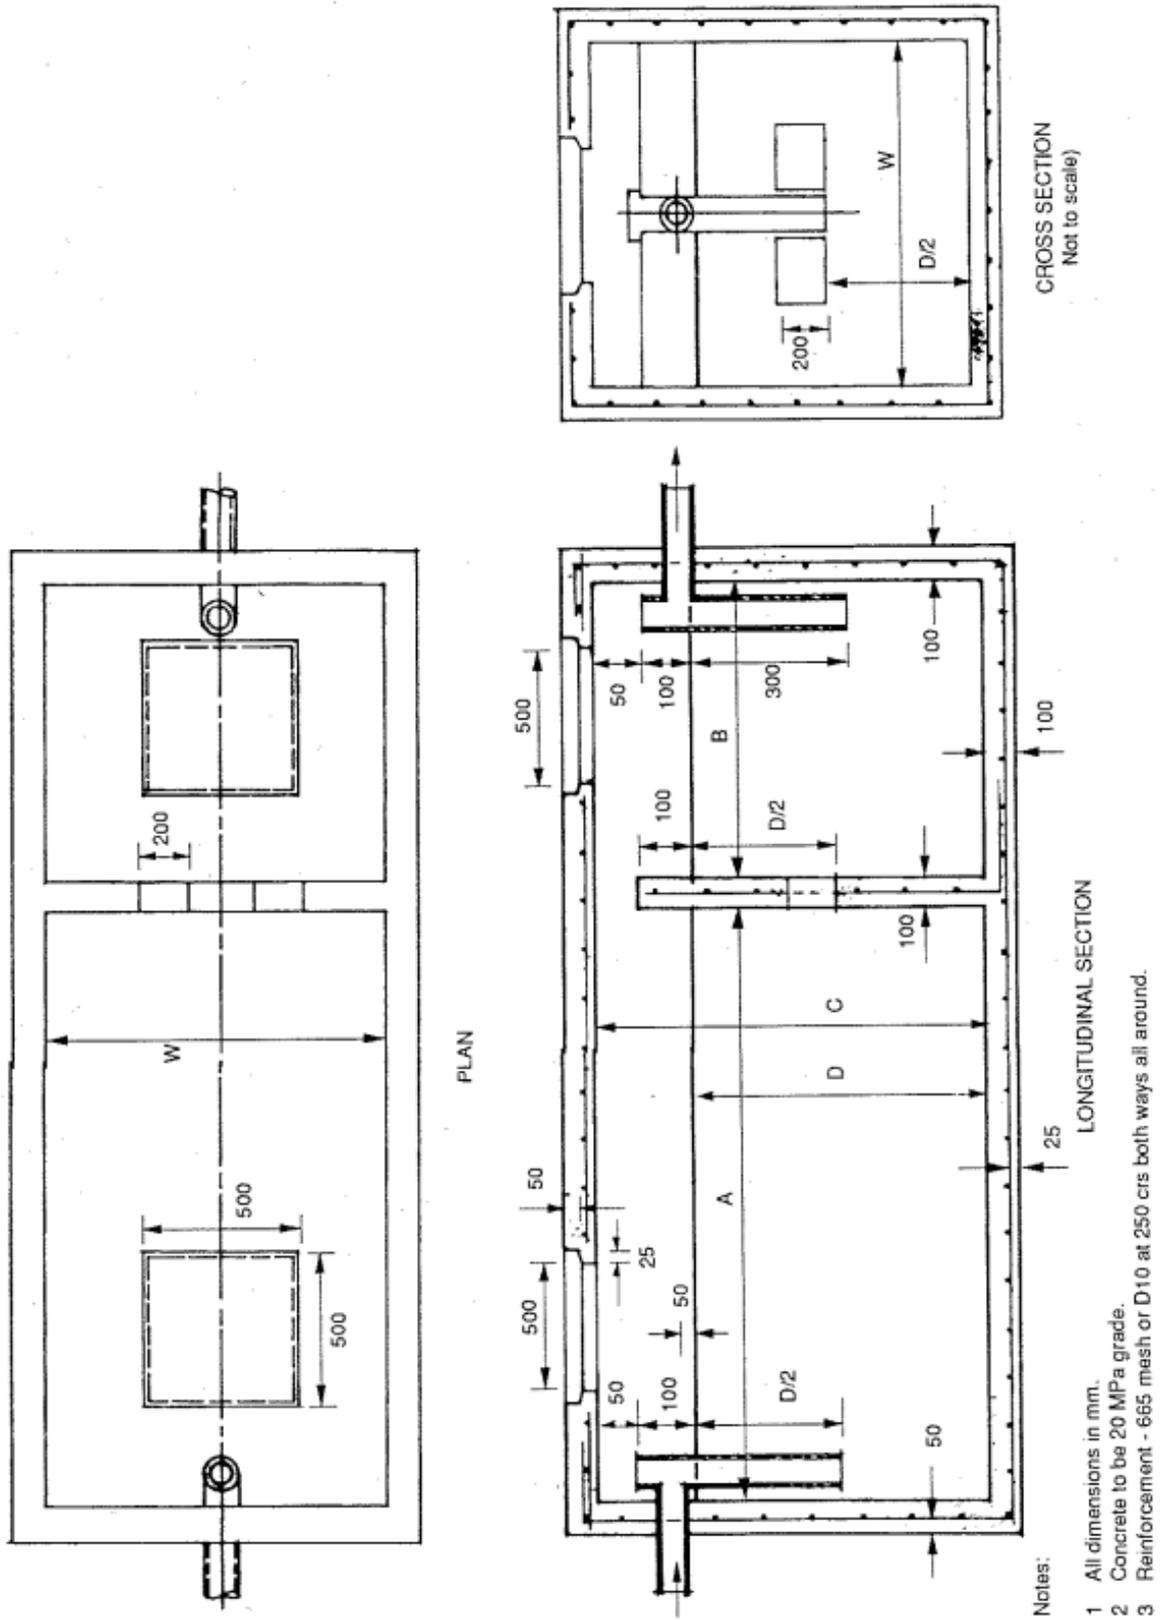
Details of Reinforced Concrete Septic Tank
